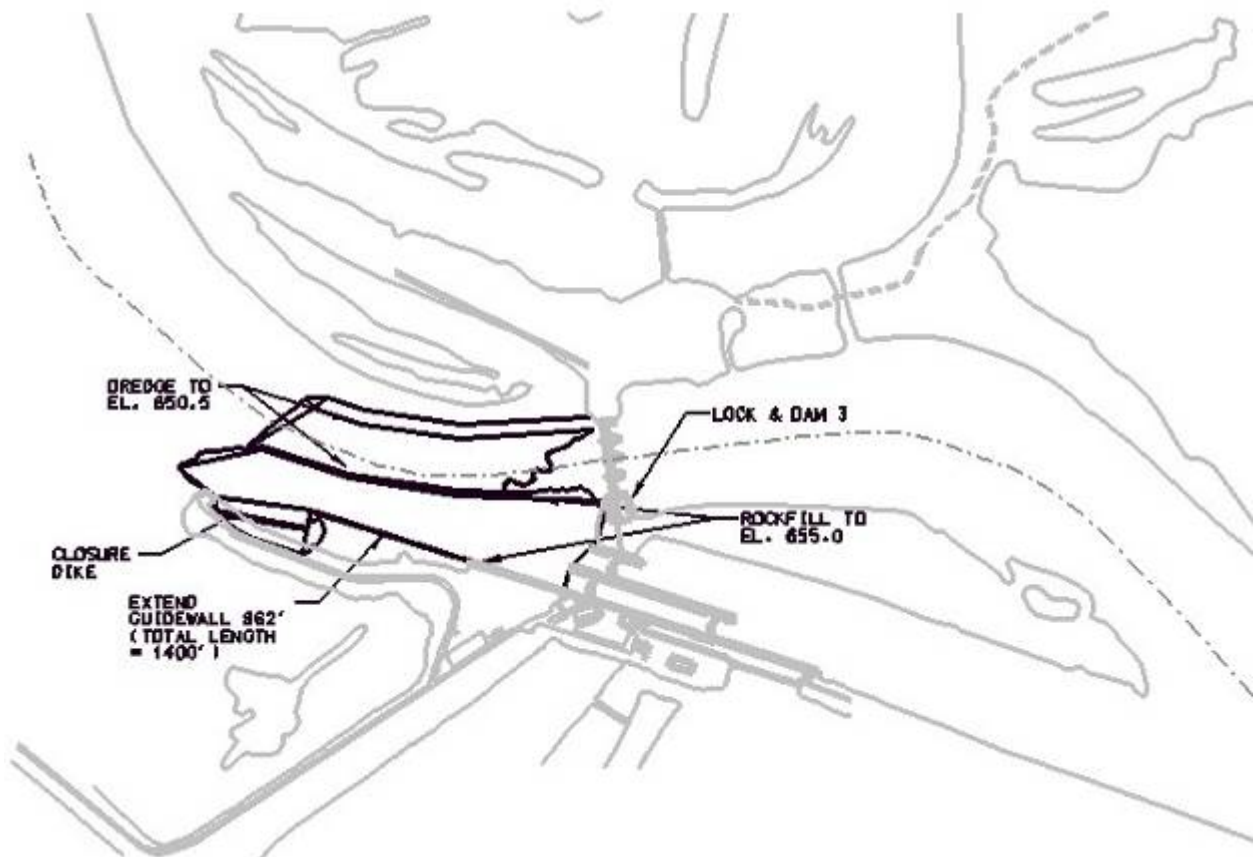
Recommended plan for navigation safety improvements at Lock and Dam 3.
